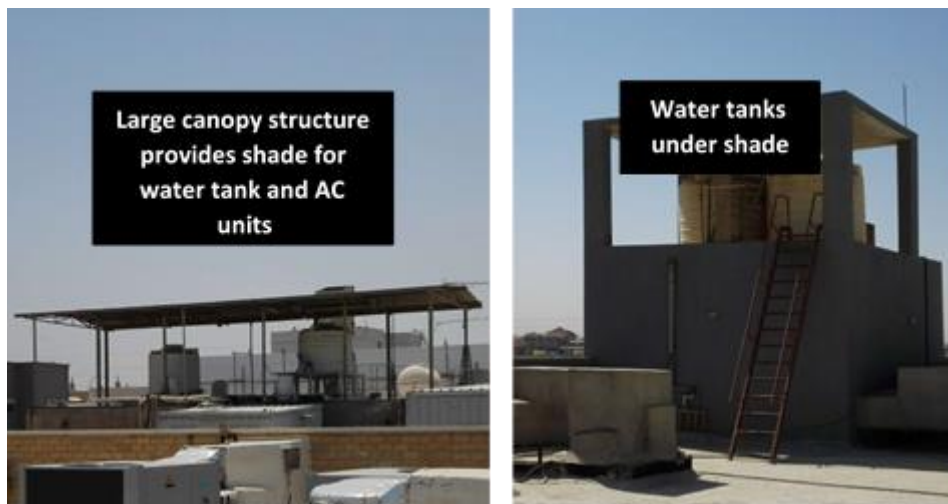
Two images showing the use of shading structures to provide shade for water tanks and AC units
